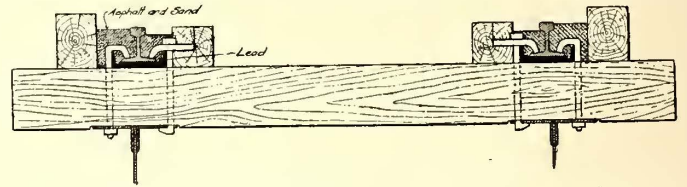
MANHATTAN EXPERIMENT, SHOWING RAILS SURROUNDED WITH ASPHALT AND RESTING UPON LEAD STRIPS CARRIED IN STEEL CHANNELS
